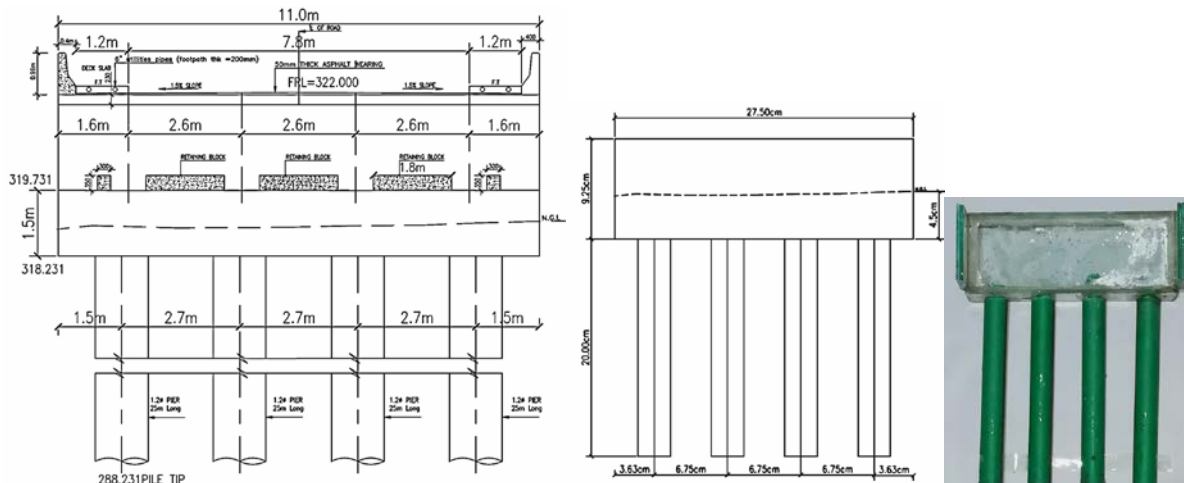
Hajizai Bridge Spill-through Abutment Prototype & Model Detail and Model Picture
